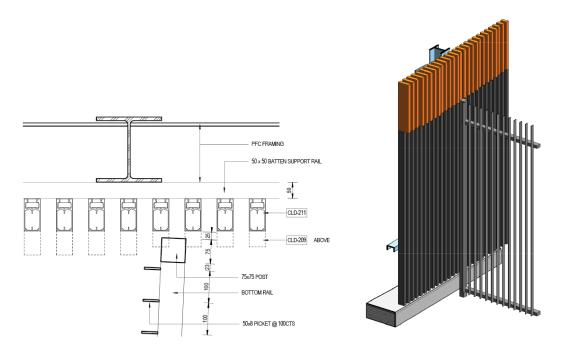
Chatswood Dive – Façade and fence junction detail – Plan (left and Isometric (right)
